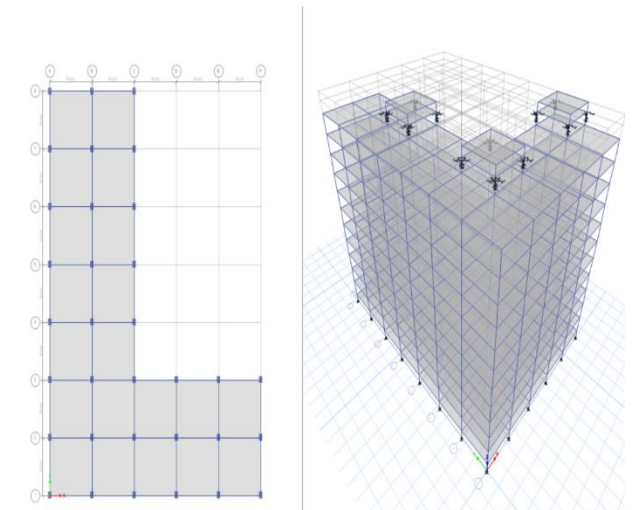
Plan and Isometric view of G+10 building with triple water tank
